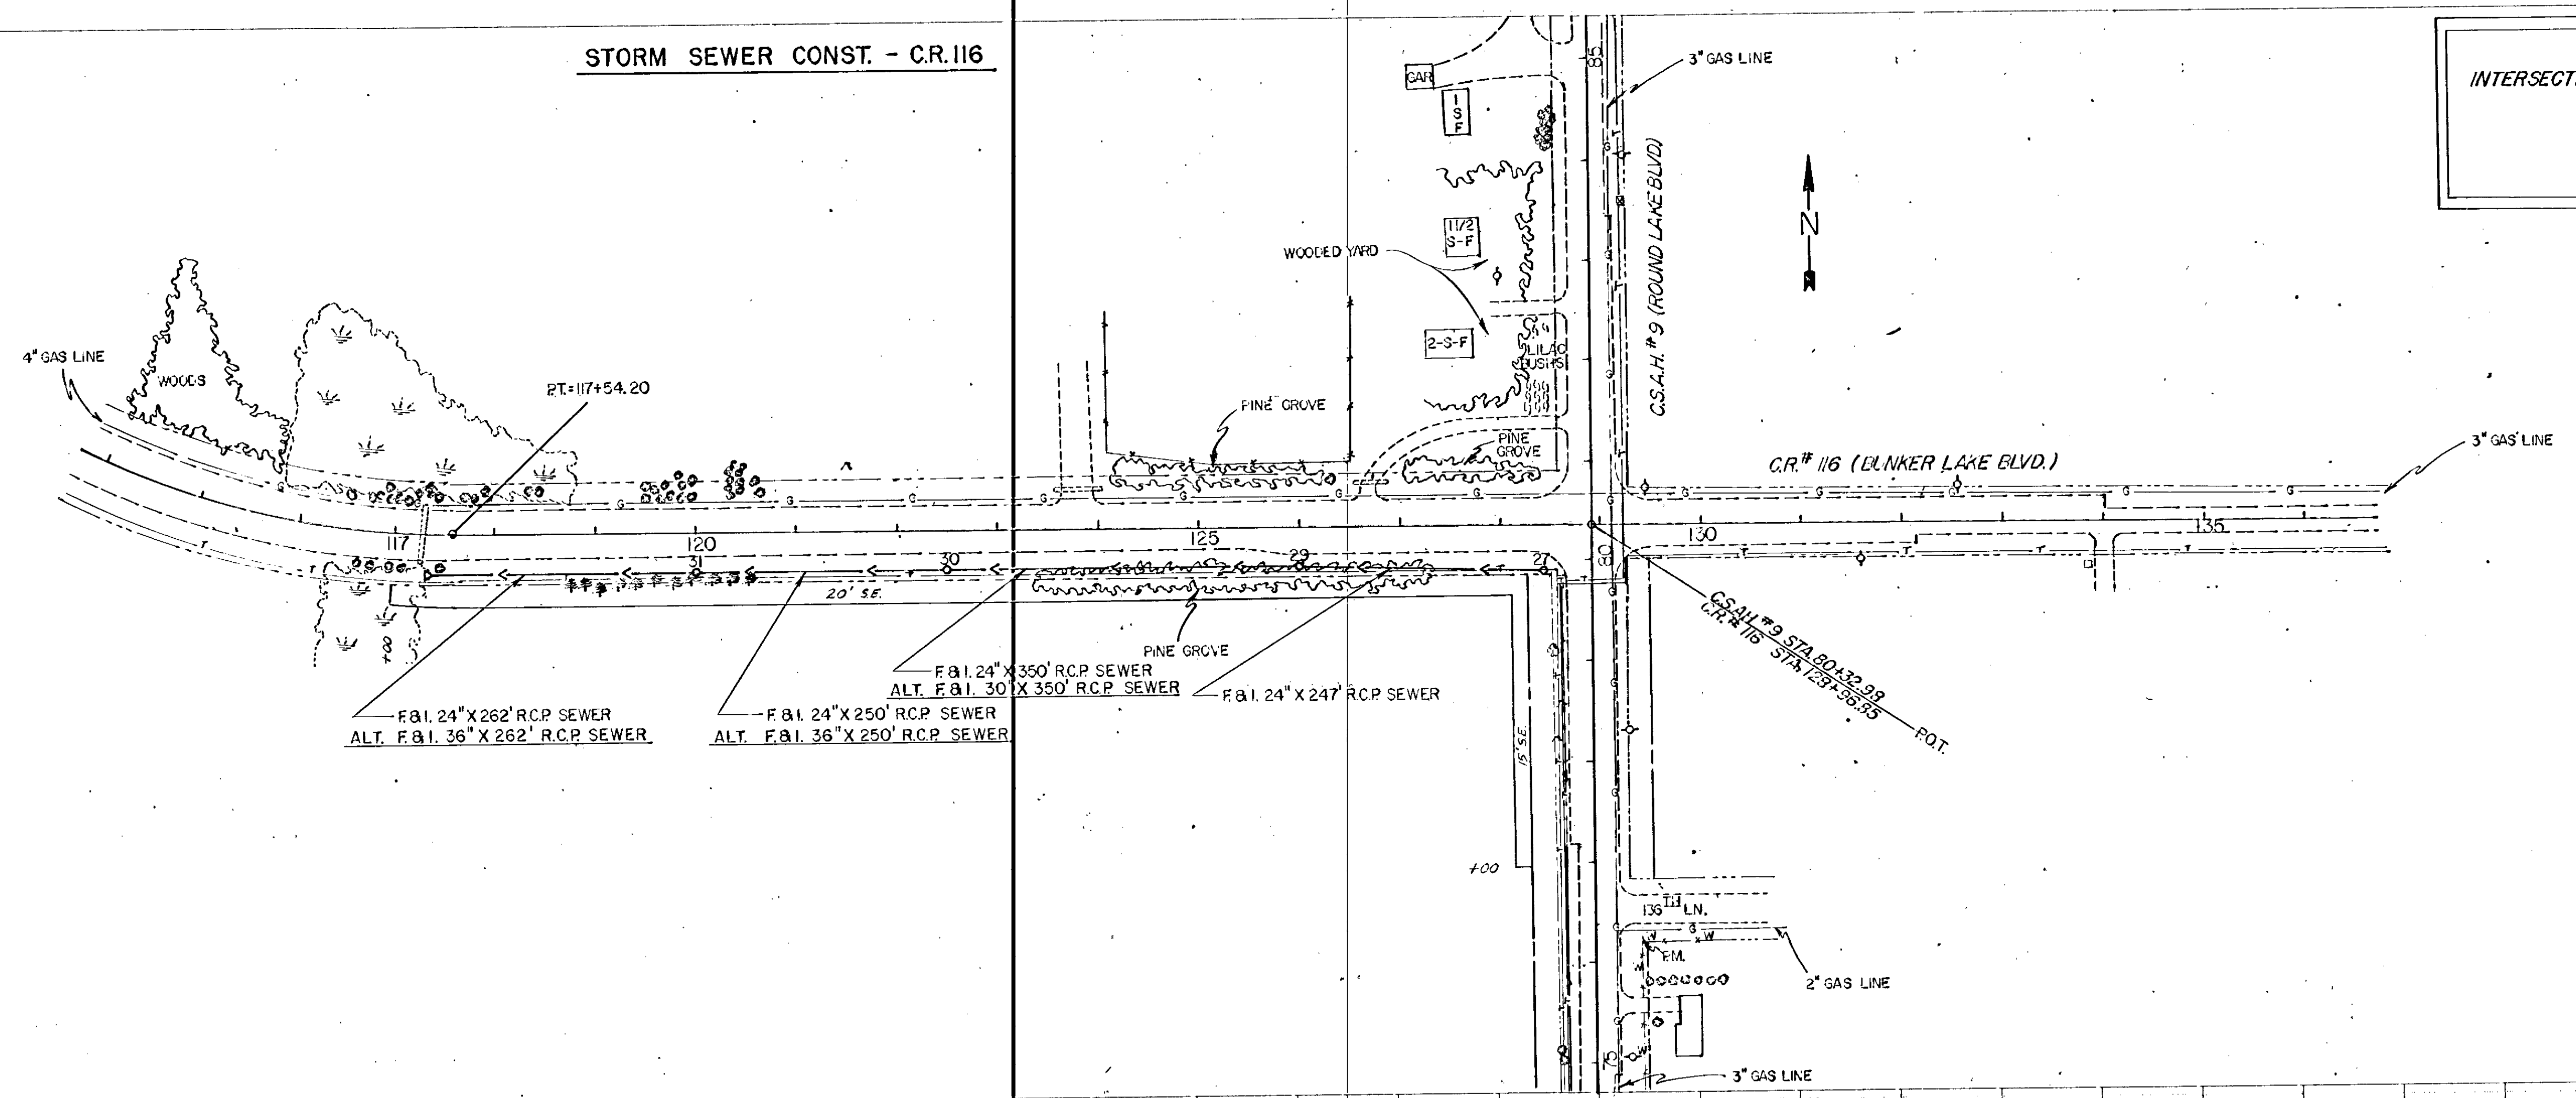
SINGLE PLAN AND PROFILE LINE & FOOT
